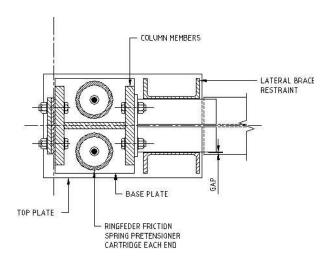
External Frame Elevation from the East/West Transverse Bracing Frame
